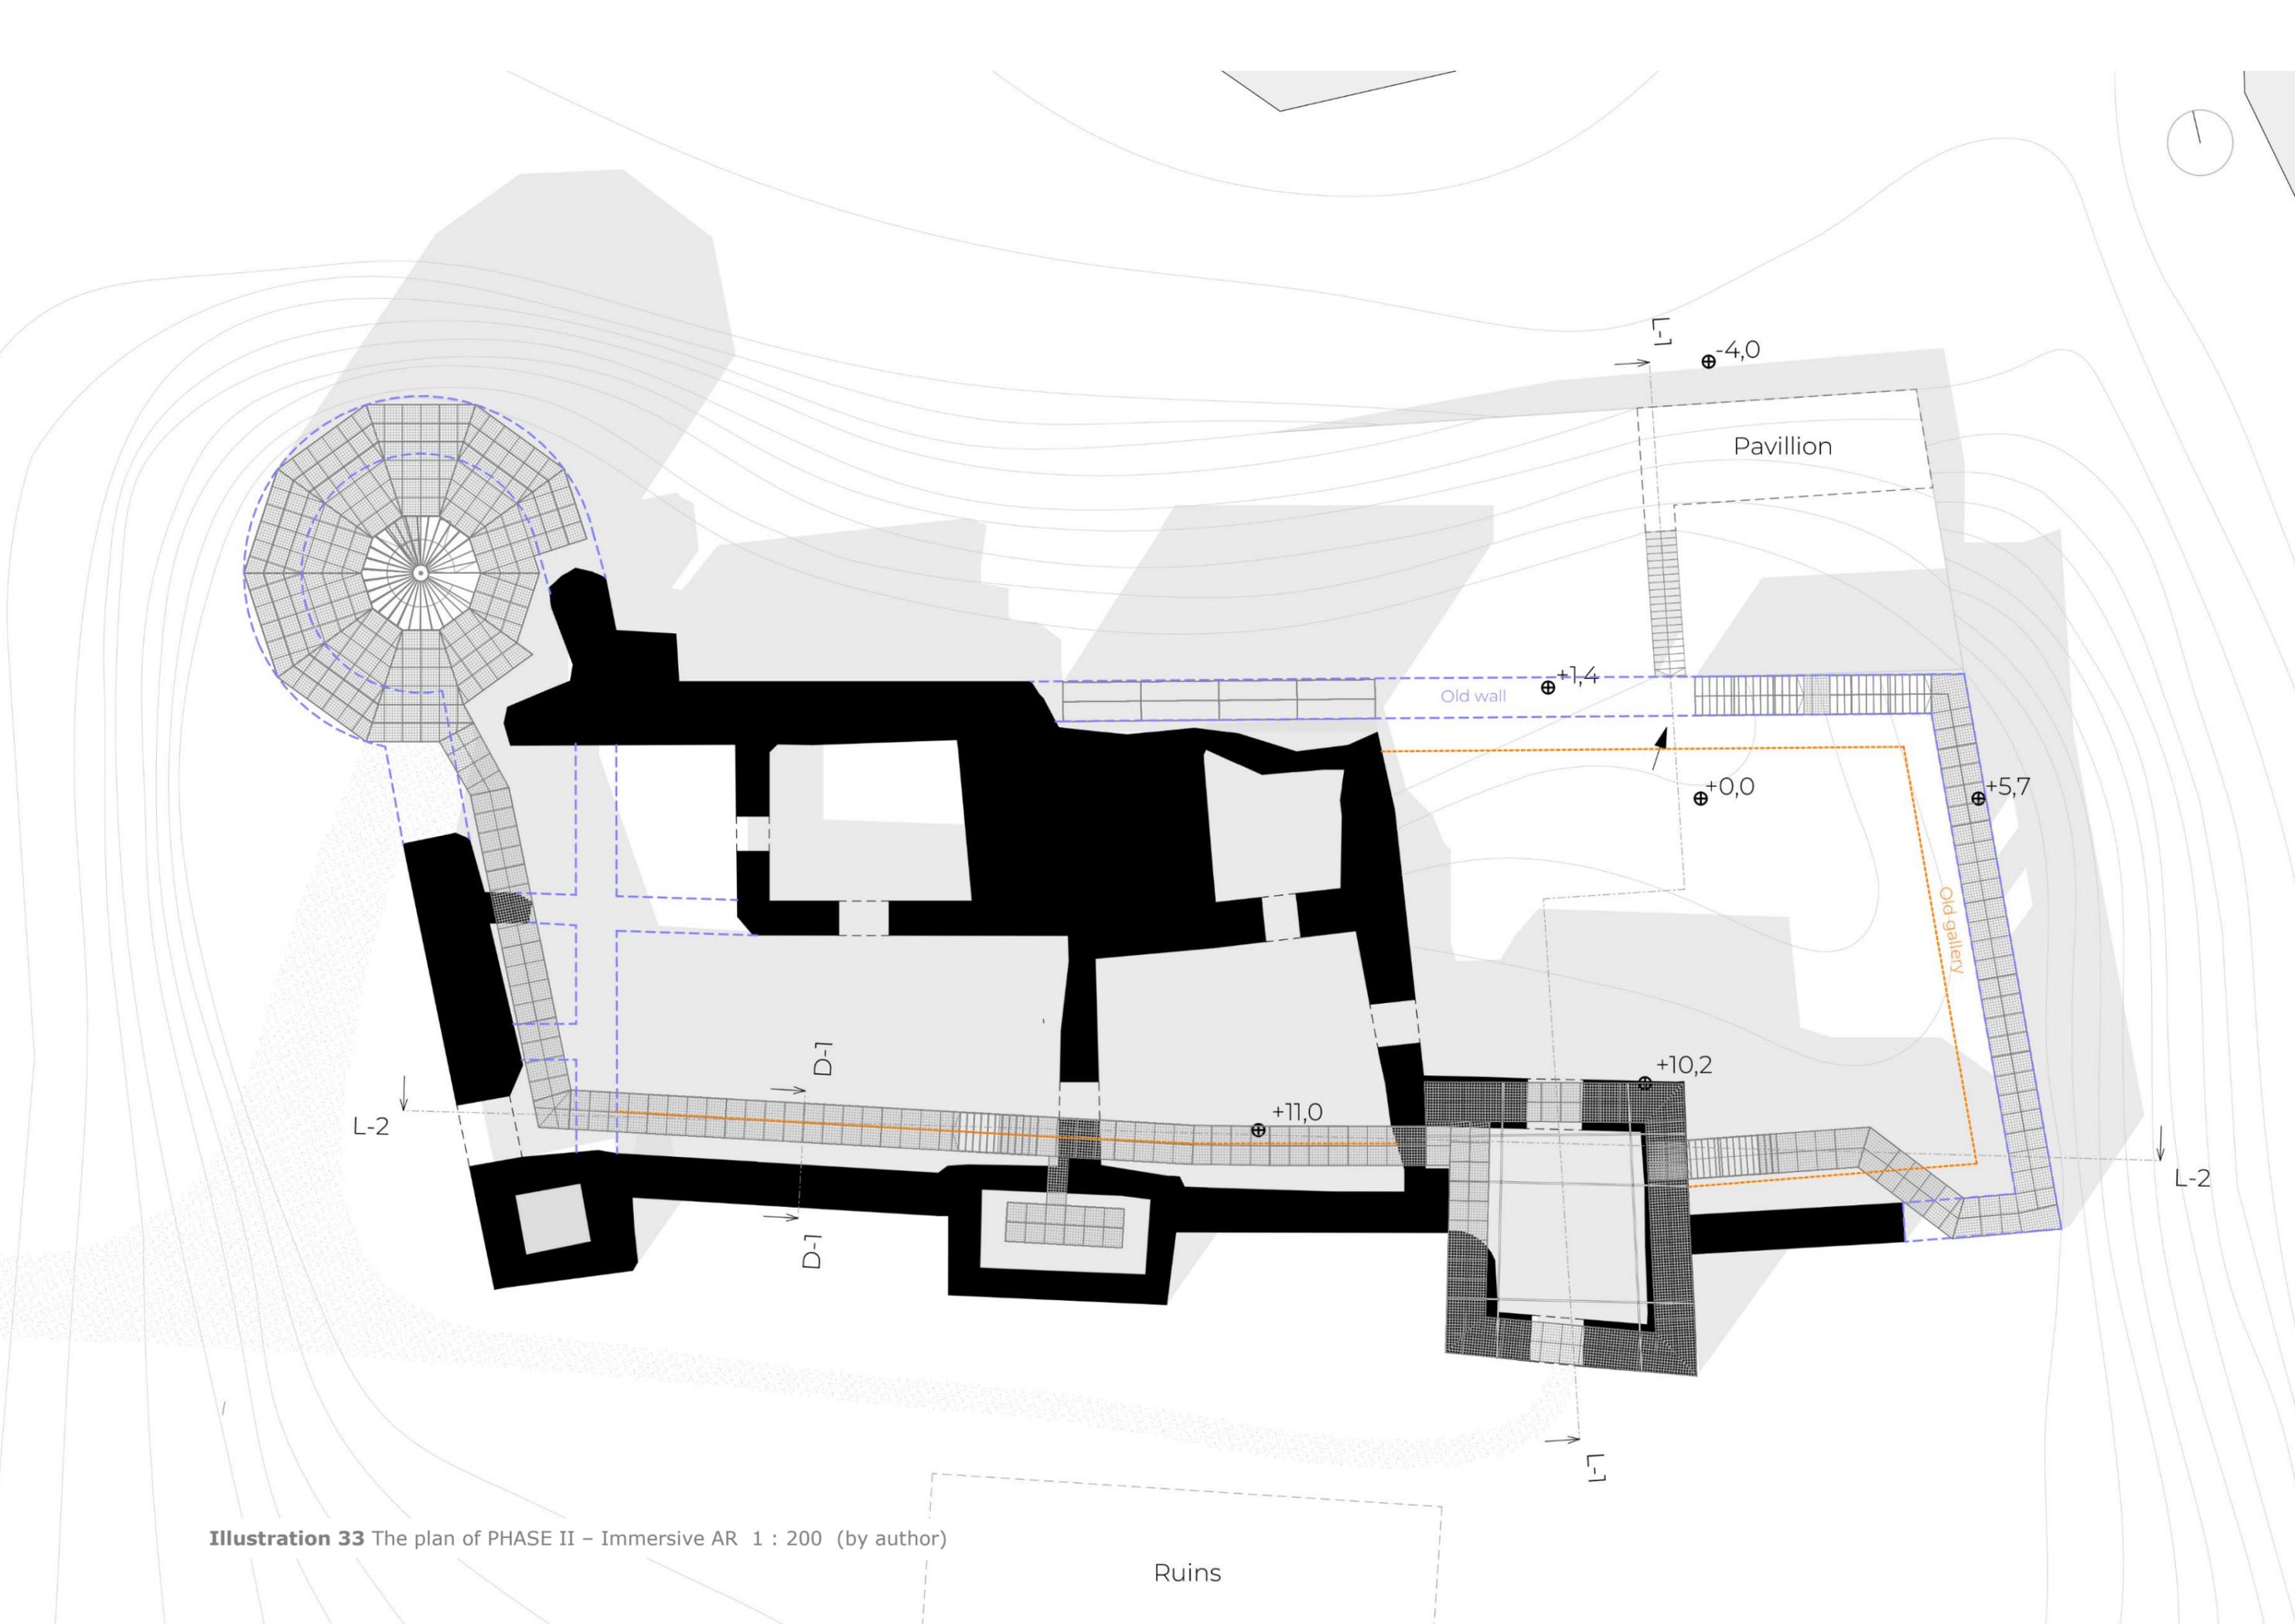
The plan of PHASE II – Immersive AR 1 : 200 (by author)
